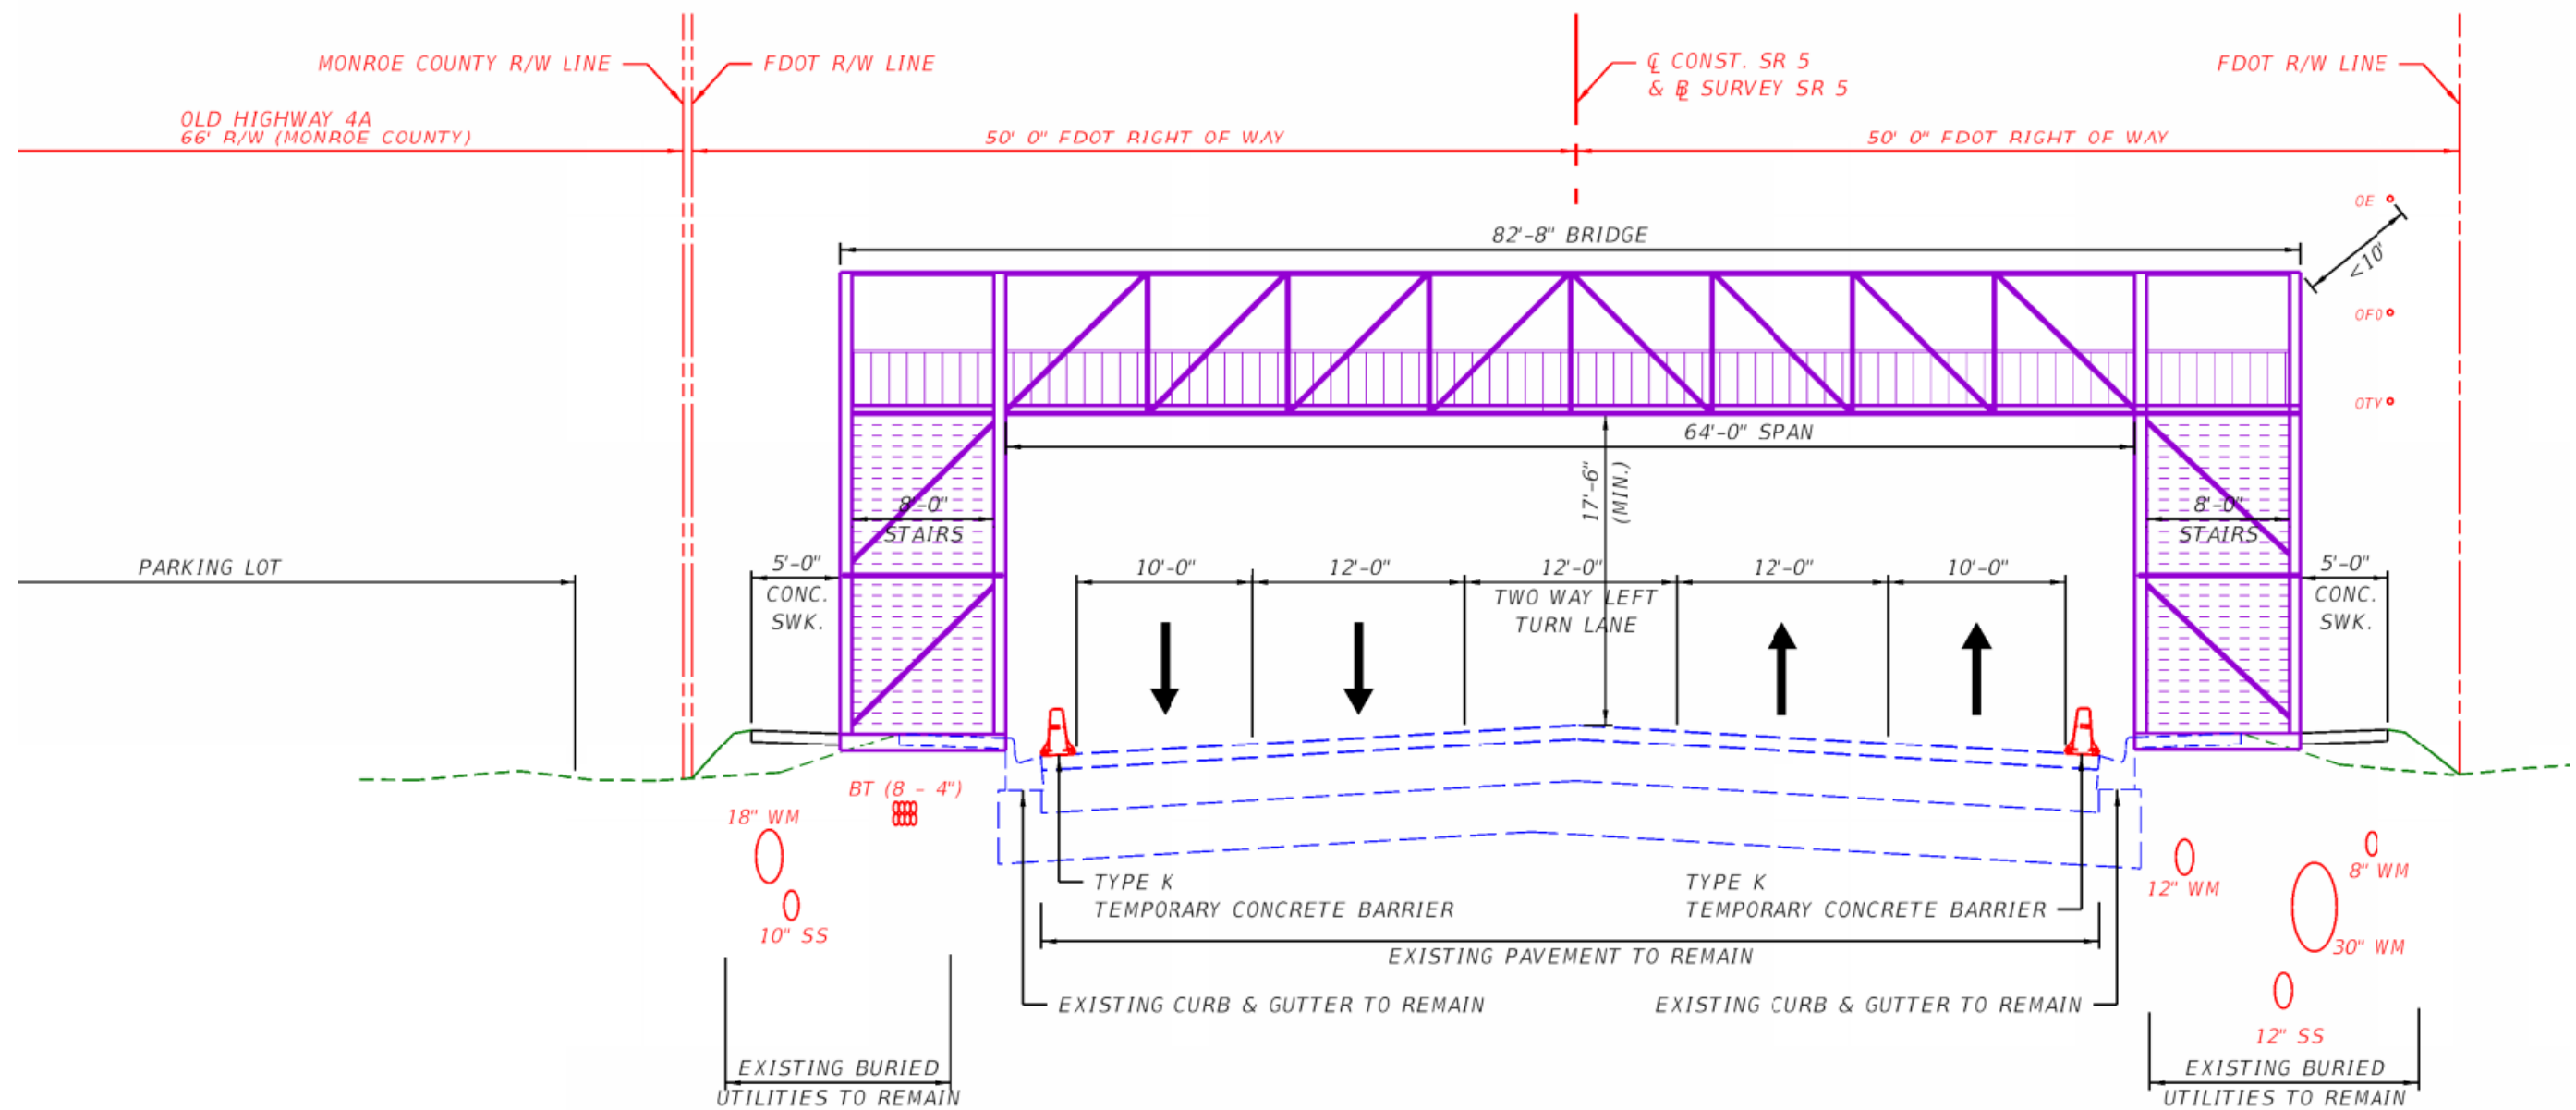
Location 2B Temporary Pedestrian Bridge Concept – Typical Section
